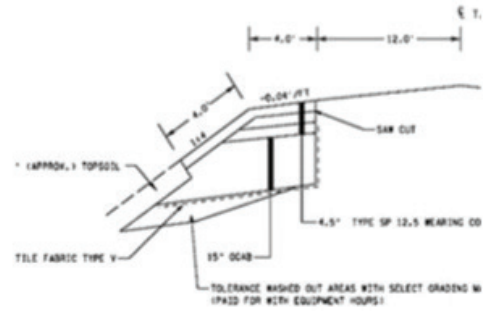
Failing typical Section 2 in 2010 flood (Courtesy of Minnesota DOT).
